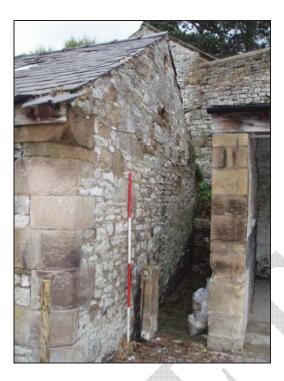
North-east wall of building (facing north-west) (scale = 2m).
